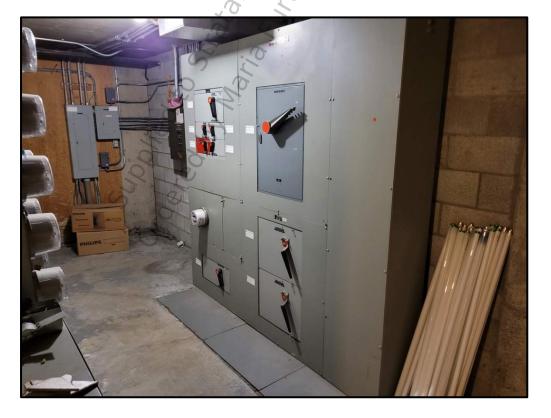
(D50 10 03) - Main Electrical Disconnect Switches
